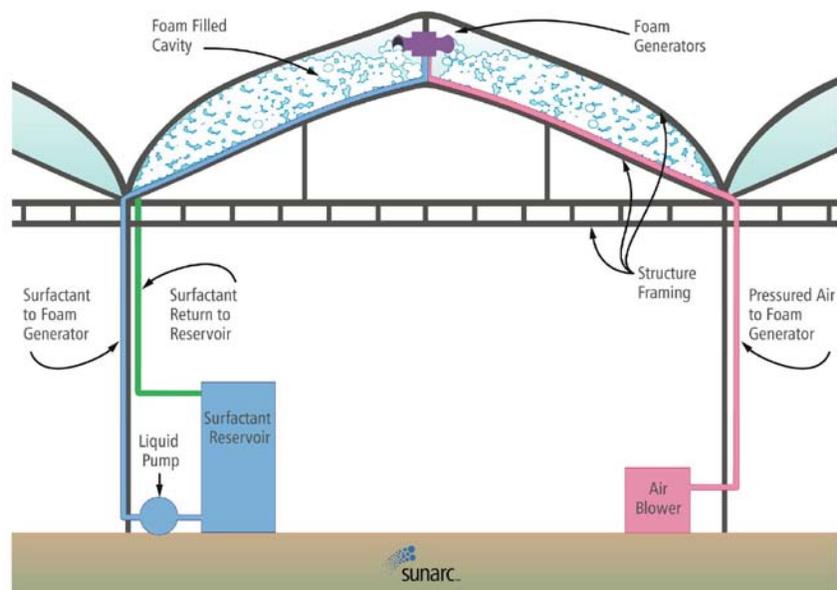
Cross-section view of multi-section greenhouse installation of a Sunarc System
